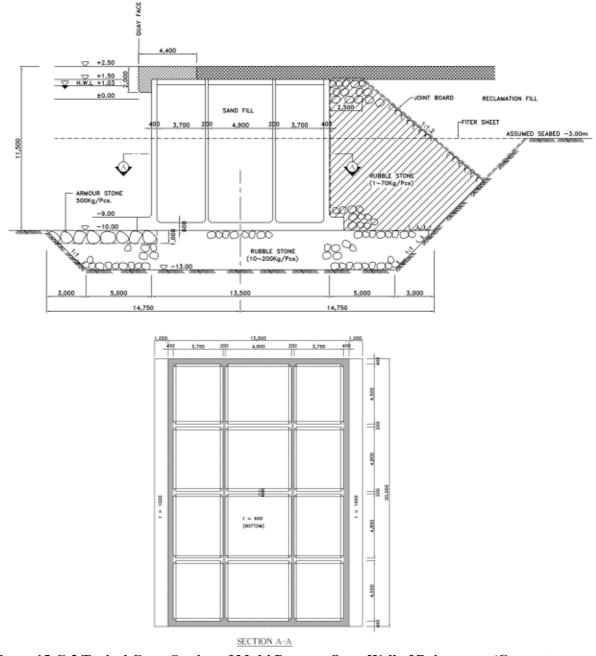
C-3 Typical Cross Section of Multi Purpose Quay Wall of Bojonegara (Concrete Caisson, -10 m)
